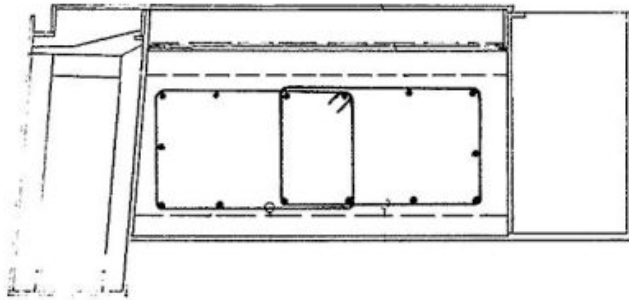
Swansea Bridge (1989) movable span cross section
